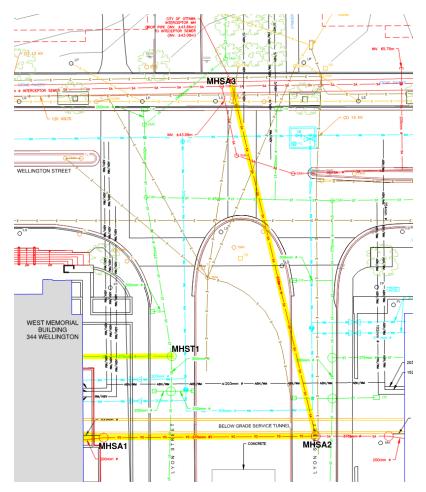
Existing sanitary sewer and storm sewer servicing West Memorial Building
